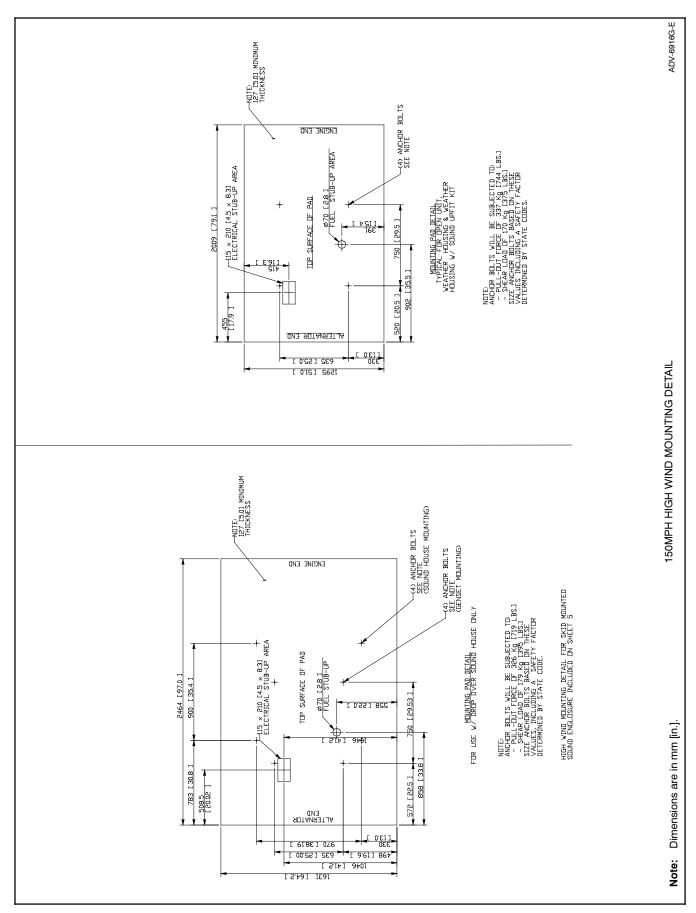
Dimension Drawing, ADV-6916G-E, Sheet 7, High-Wind Mounting Detail
